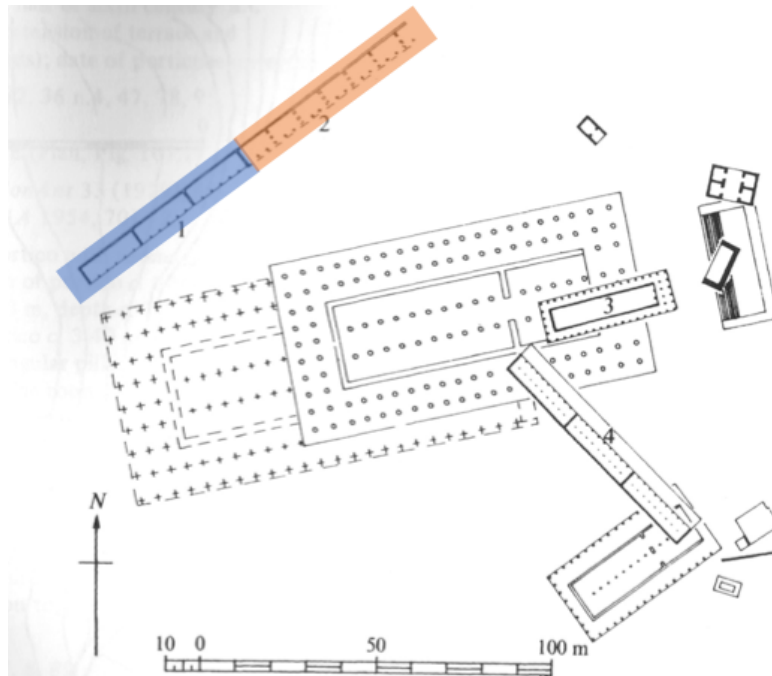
Plan of stoa at Samos. Highlighting original construction of North-west stoa in blue and its later extension in orange.
